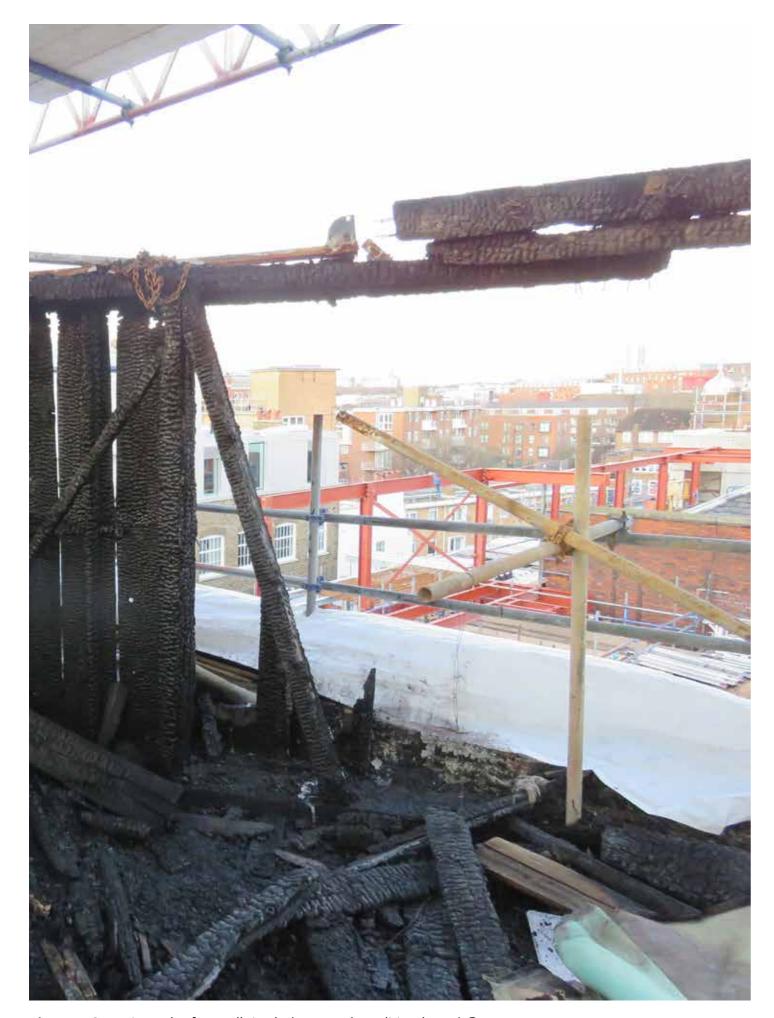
Horizontal rafter wall ties (M) east end condition (2020) © SLHA
